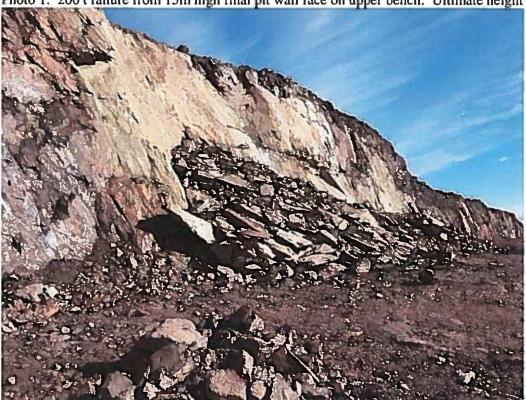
200 t failure from 15m high final pit wall face on upper bench. Ultimate height will be ~25m
